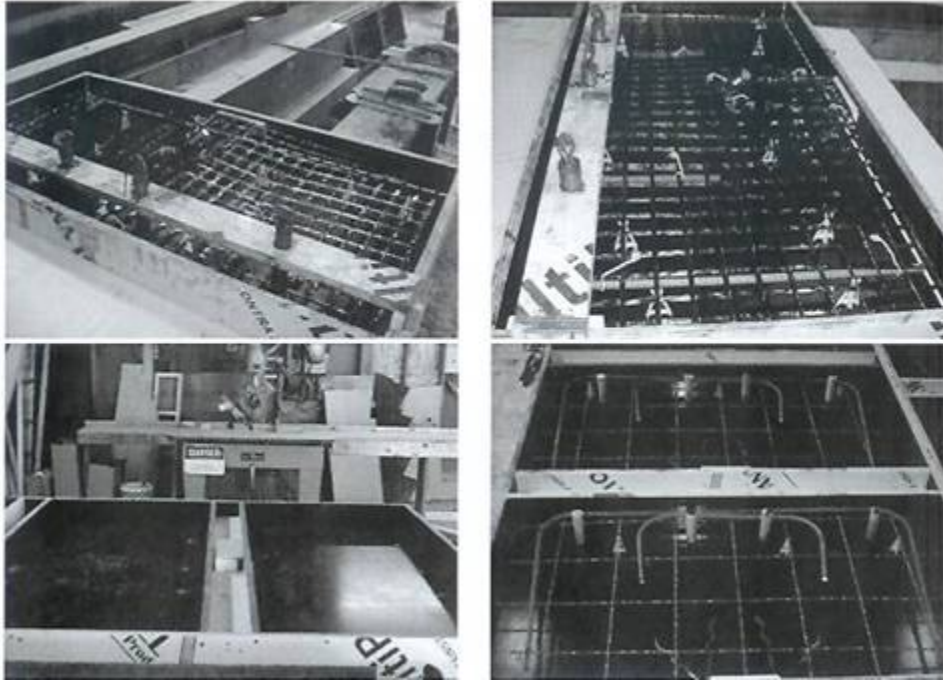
Photographs of 3.25" Altus panels prior to concrete placement
